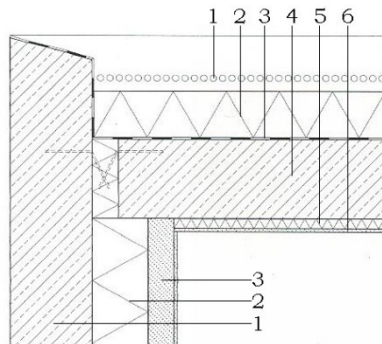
Ext. wall-flat roof coupling detail, “House in Zurich, Switzerland” (Detail, 2008, 1/2, p. 35.)
